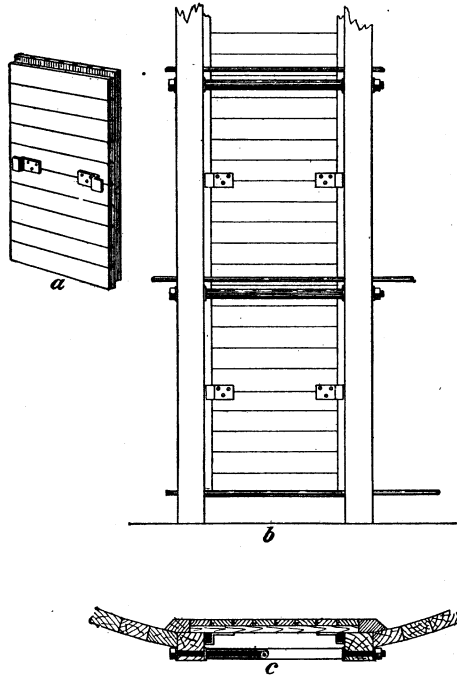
A continuous door: *a*, A section of the door; *b*, doorframe with door in position; *c*, cross section showing door and frame.
